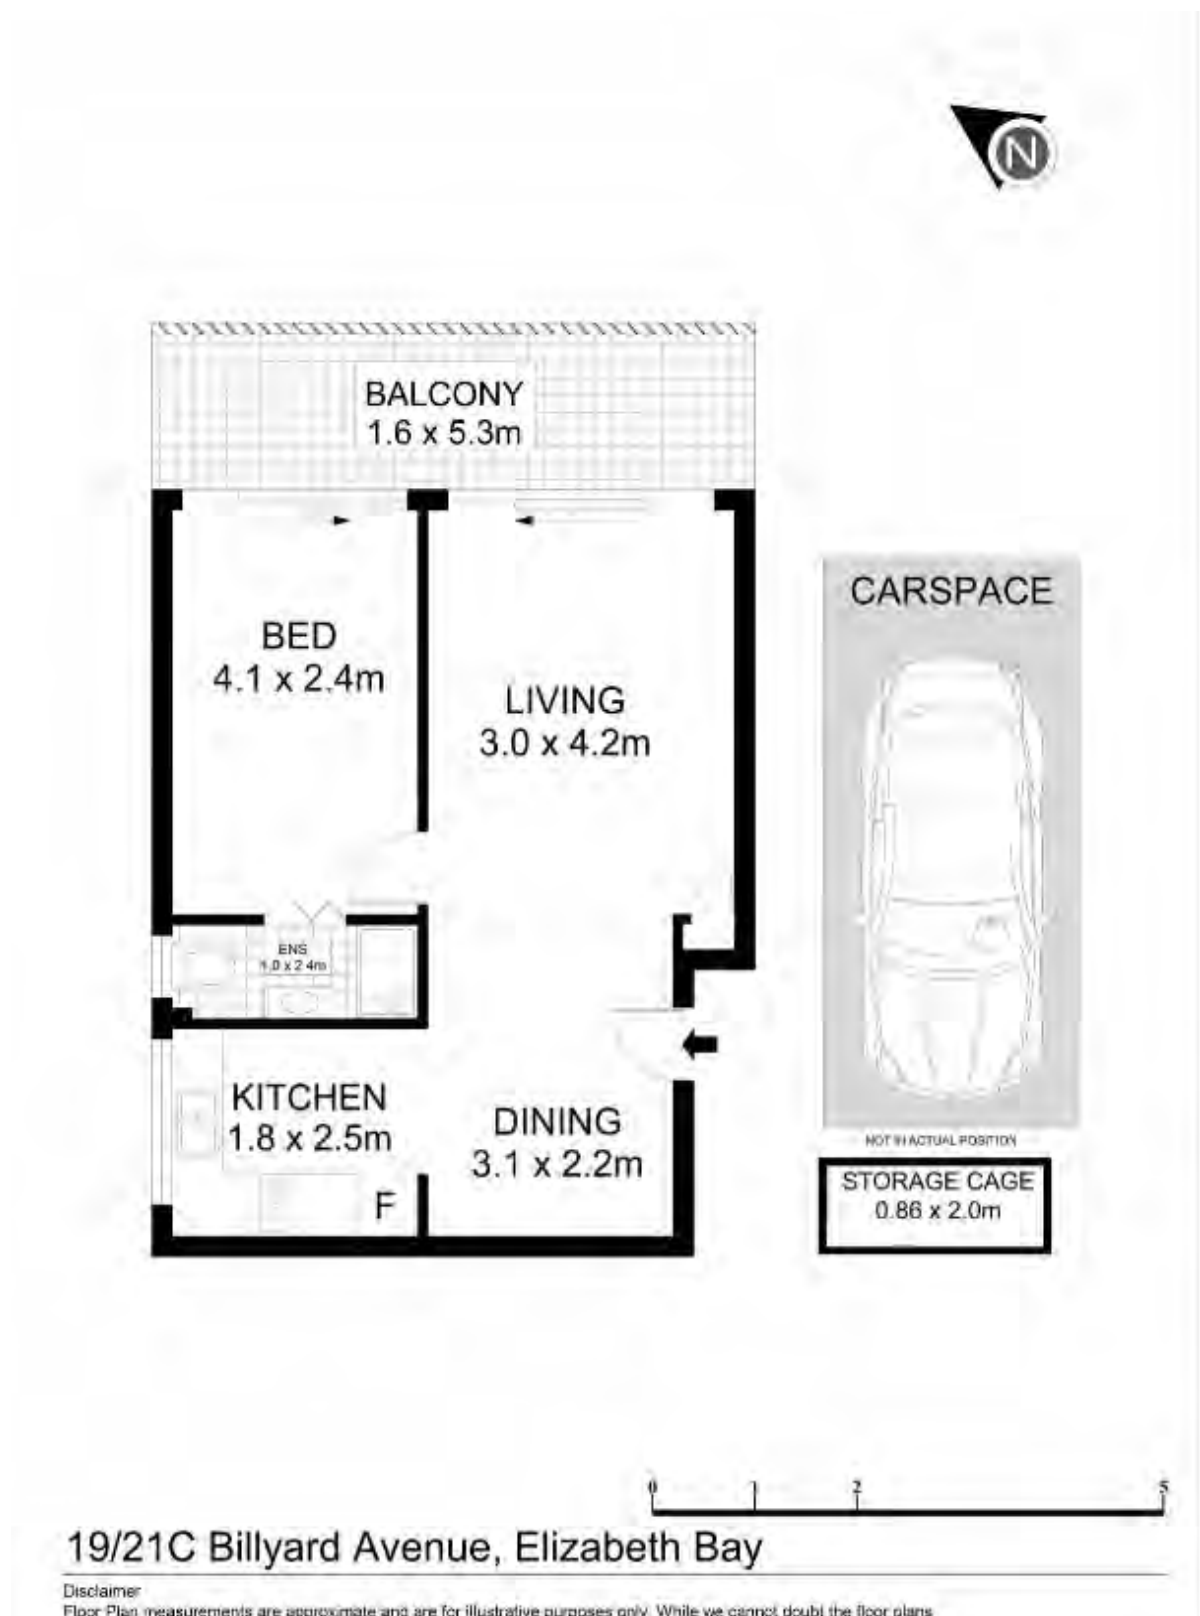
Floor plan, flat 19/21C Billyard Avenue.
